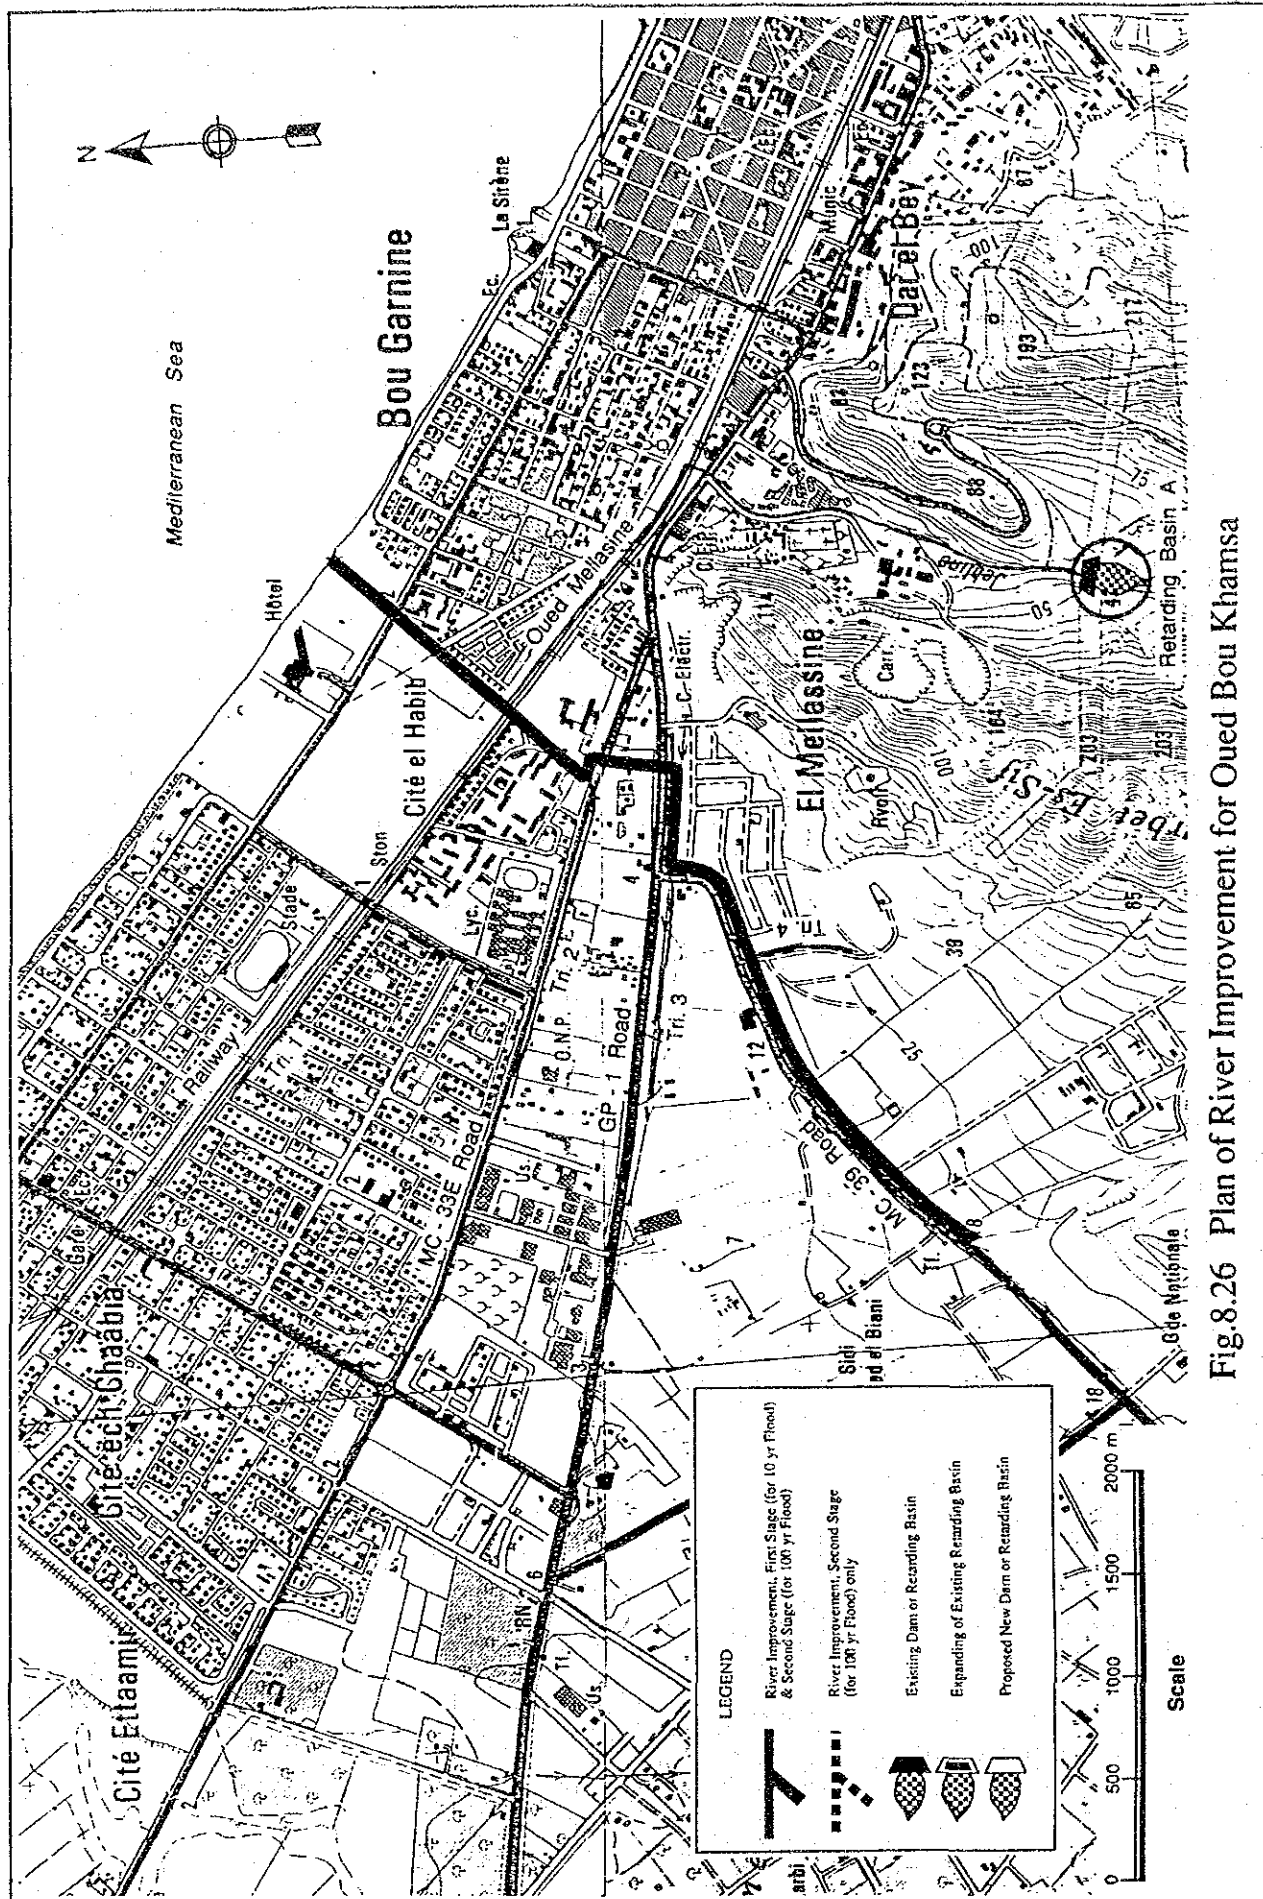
Plan of River Improvement for Oued Bou Khamsa
